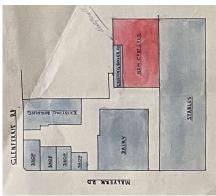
(L) Site plan for the corner building, proposed dairy building (centre) and stables, 1934 (SHC Ref No 11920)
